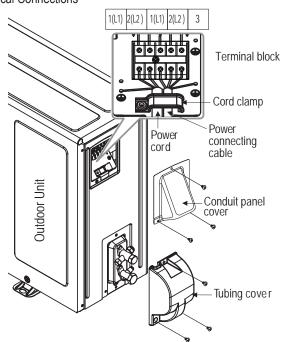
180HEV Outdoor Unit - Electrical Connections
